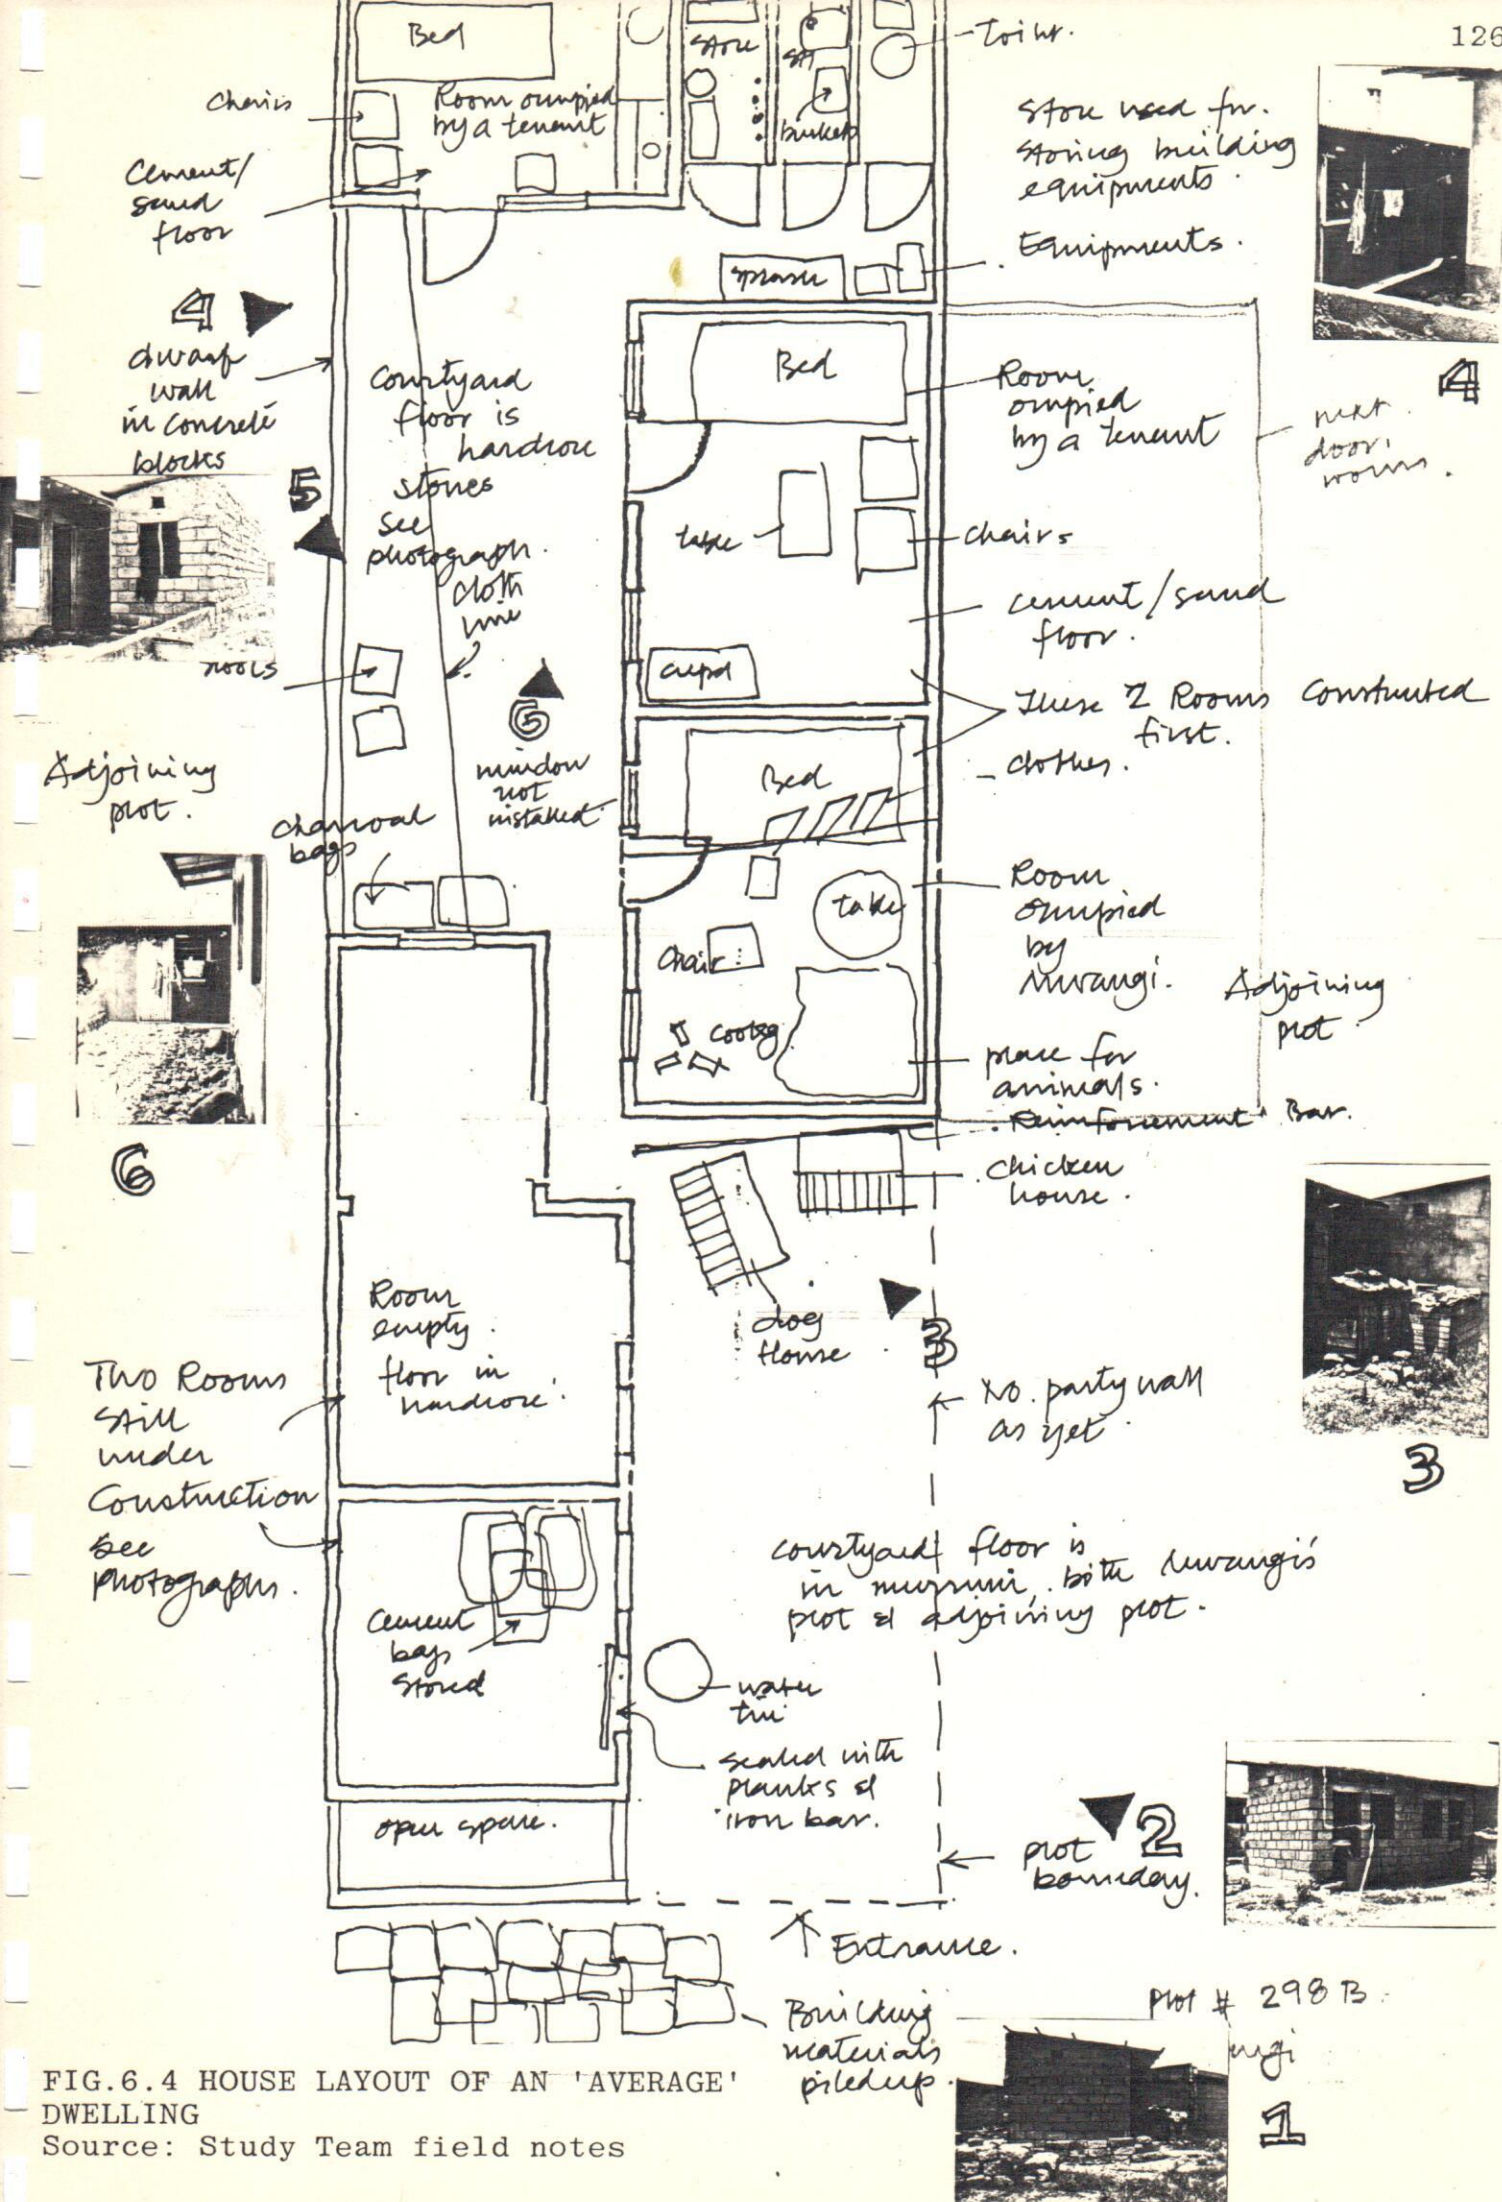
HOUSE LAYOUT OF AN 'AVERAGE' DWELLING
